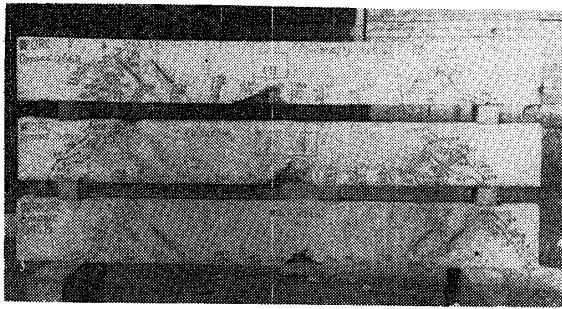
,a Left side crack of the steel bar over reinforced concrete beams
